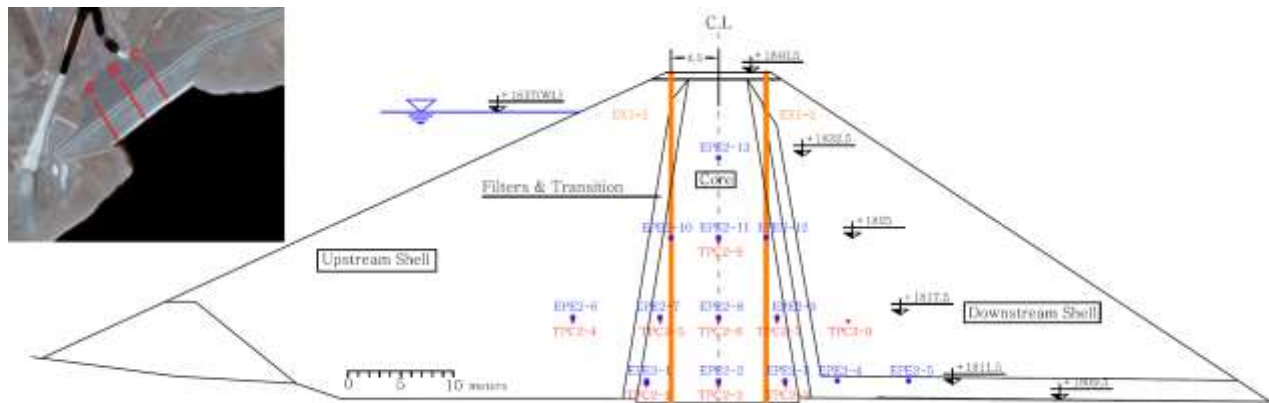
The plan view of Siah Sang dam and arrangement of instruments in Section B (Critical Section) [9]
